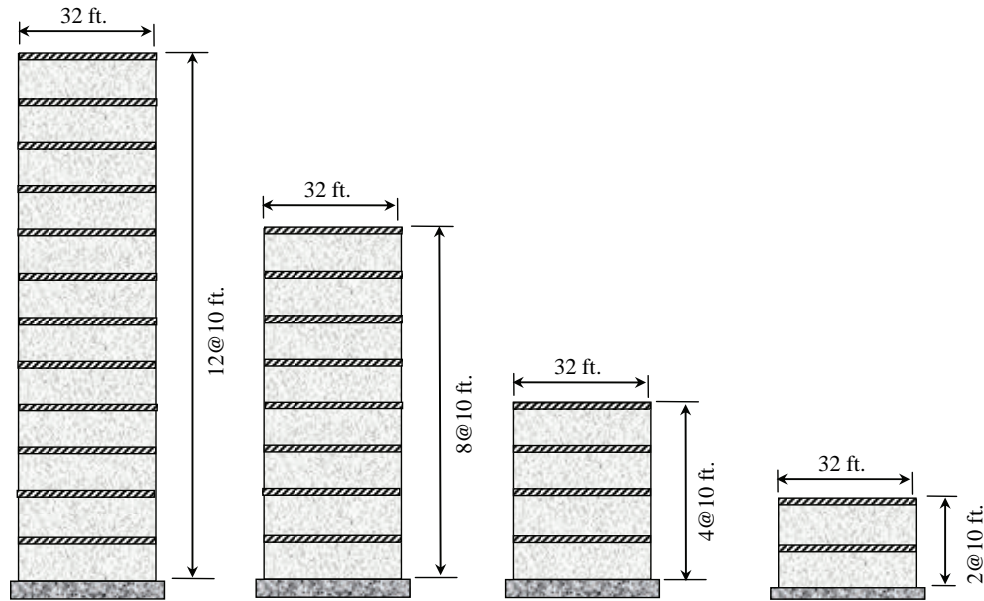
Dimensions of multistory reinforced masonry shear walls.
